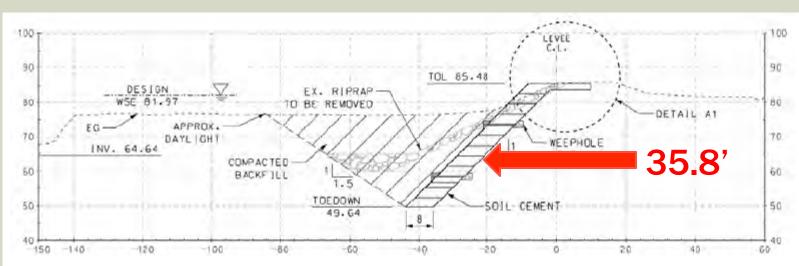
Typical Cross Section of Alternative 1, Soil Cement for Design Flow (Sta. 270+00)
